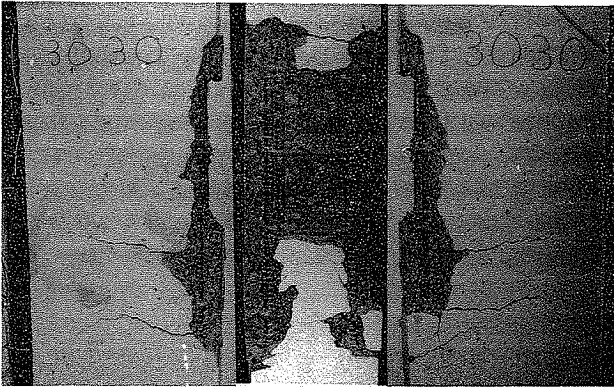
Failure of S.B.-specimen No. 30/30.
